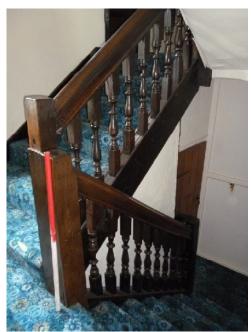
Stairs from First Floor Room 6 to Ground Floor Room 7
